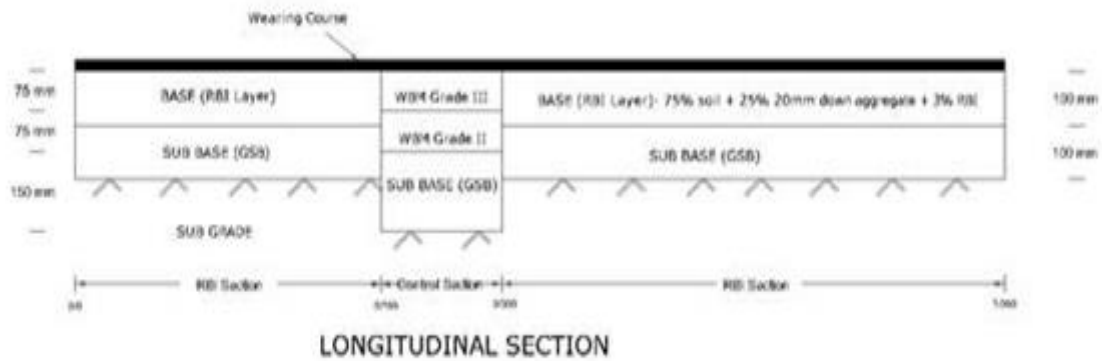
Longitudinal cross section of RBI Grade 81 road
